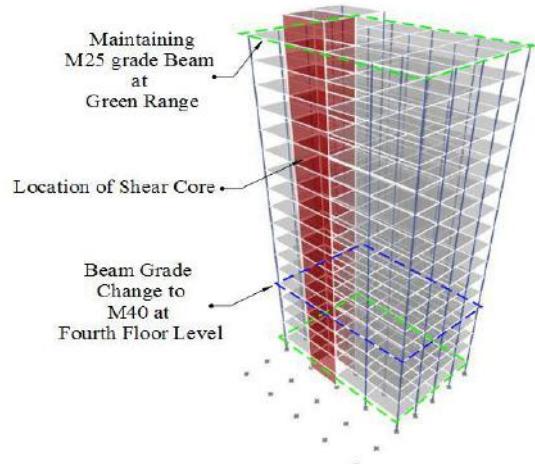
Beam Stability Case - Beams of different sizes (All M40 grade beams at fourth floor level): Case BS3
